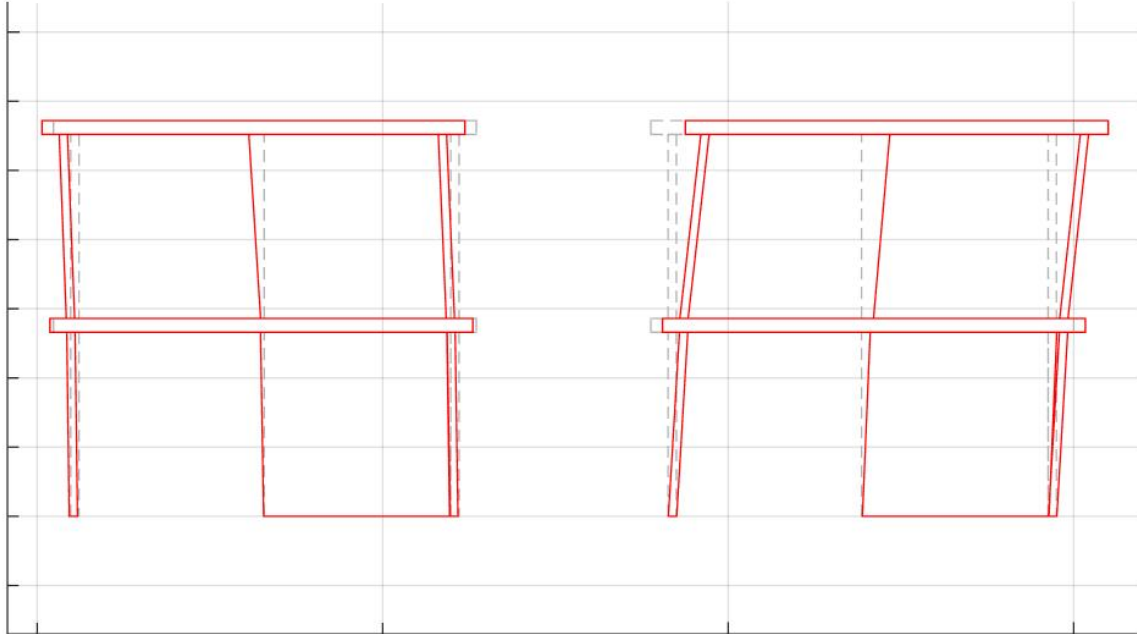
Deformed shape of EUC-BUILD4 specimen (max and min) – Test run #1.
